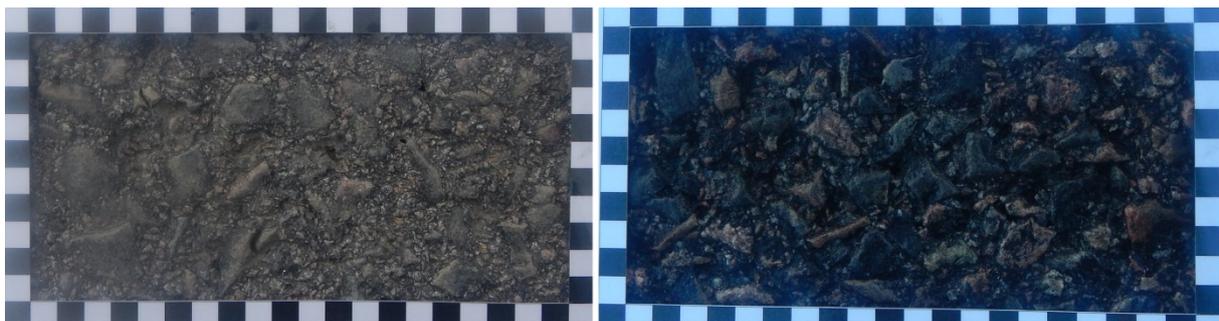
Pavement at the test site Rokinge - dry conditions (left), damp conditions (right).
